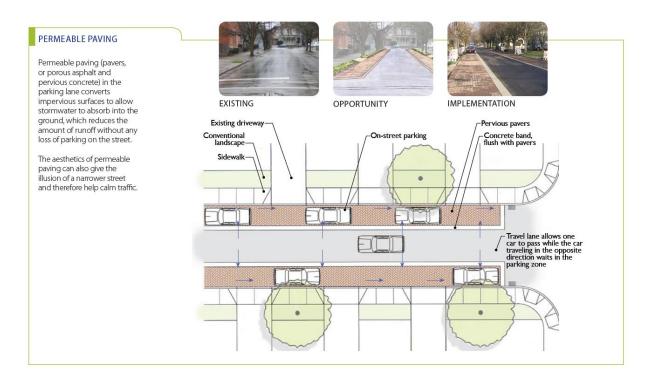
Green Streets with Permeable Pavement (EPA, 2009)
